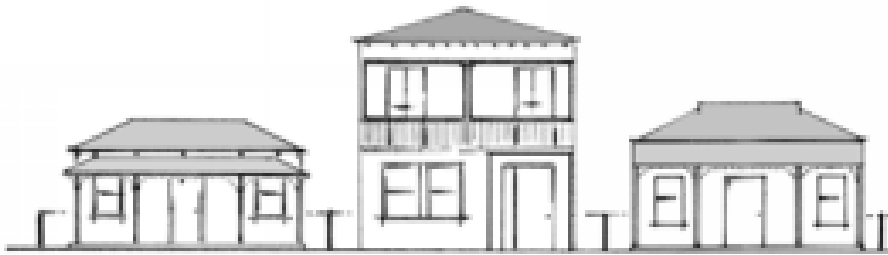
Inappropriate infill not orientated to address the street and inconsistent with the existing streetscape.
